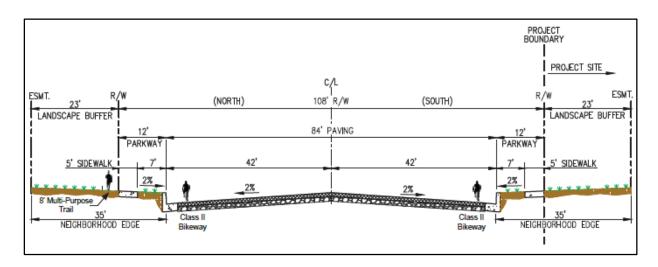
Merrill Avenue (108' ROW) Typical Landscape Street Cross Section
